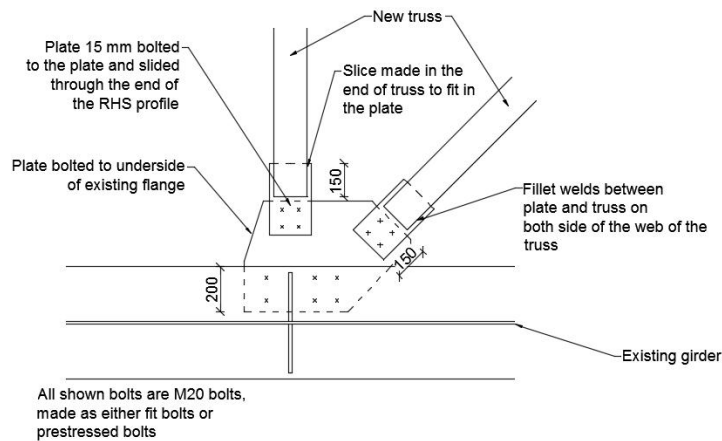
The first solution for the connection between the K-shaped truss system and the bottom flange of the existing girder
